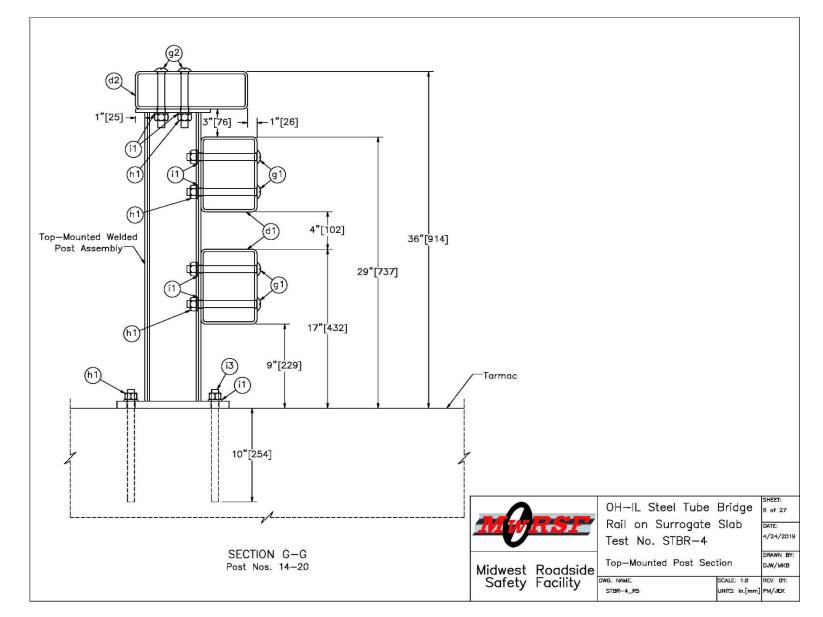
Top-Mounted Post Section, Test No. STBR-4
